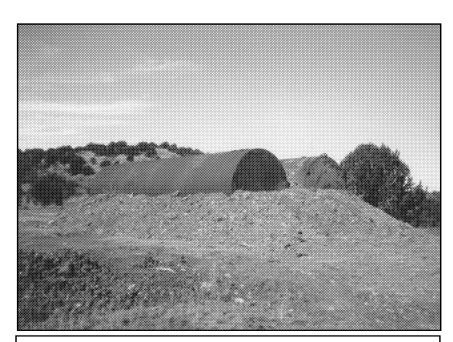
Two 20,000-gallon storage tanks to provide water replacement facilities upland.
